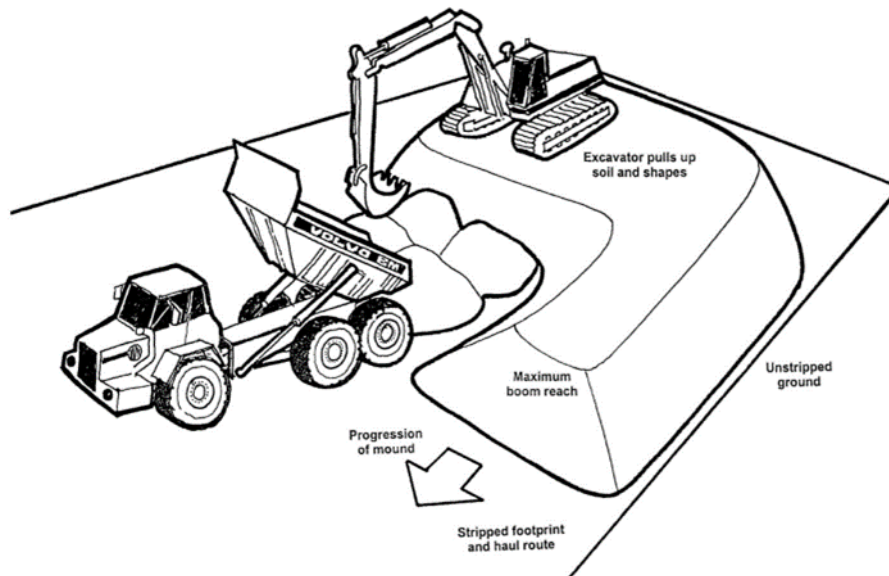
Soil storage mound construction with excavators and dump trucks. Reproduced from MAFF, 2000 (Ref: 1-2)
